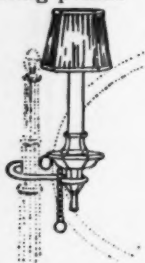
Detail of Lighting Bracket showing the method of fixing.
